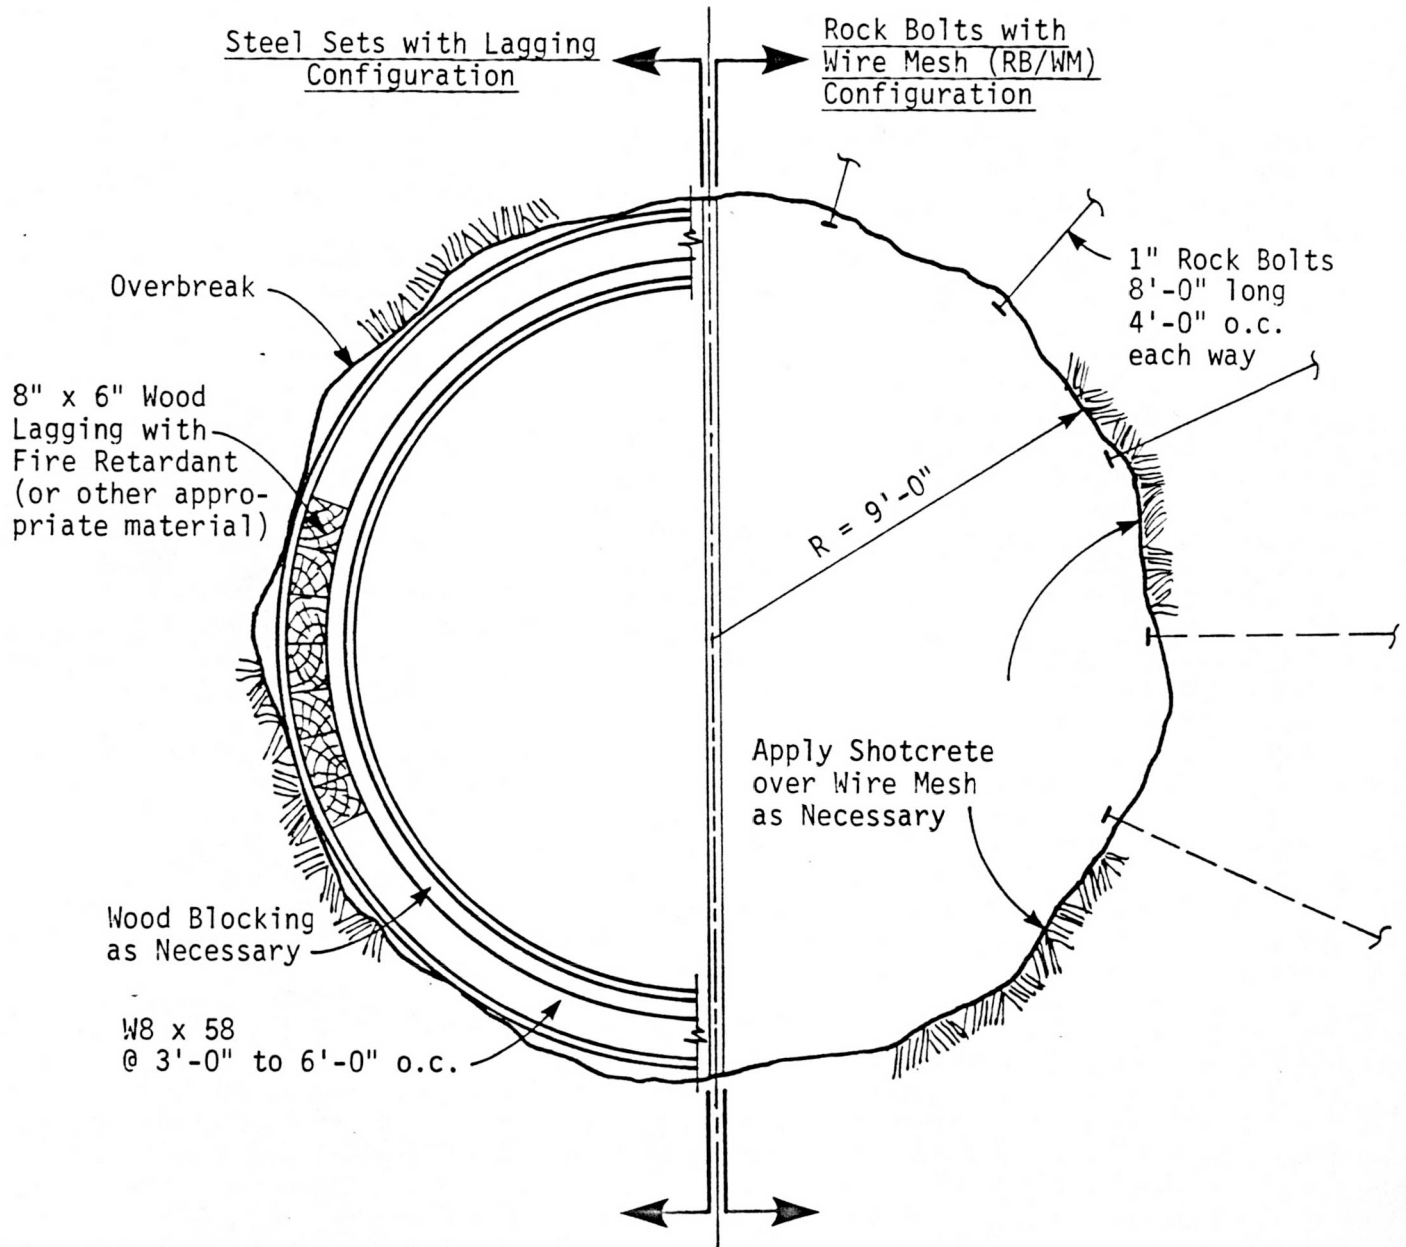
ASSUMED TUNNEL CROSS SECTION.
